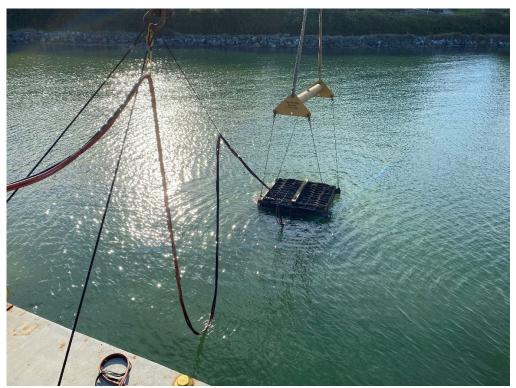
Backfill underway utilizing the 2-inch thin layer cap steel table.
